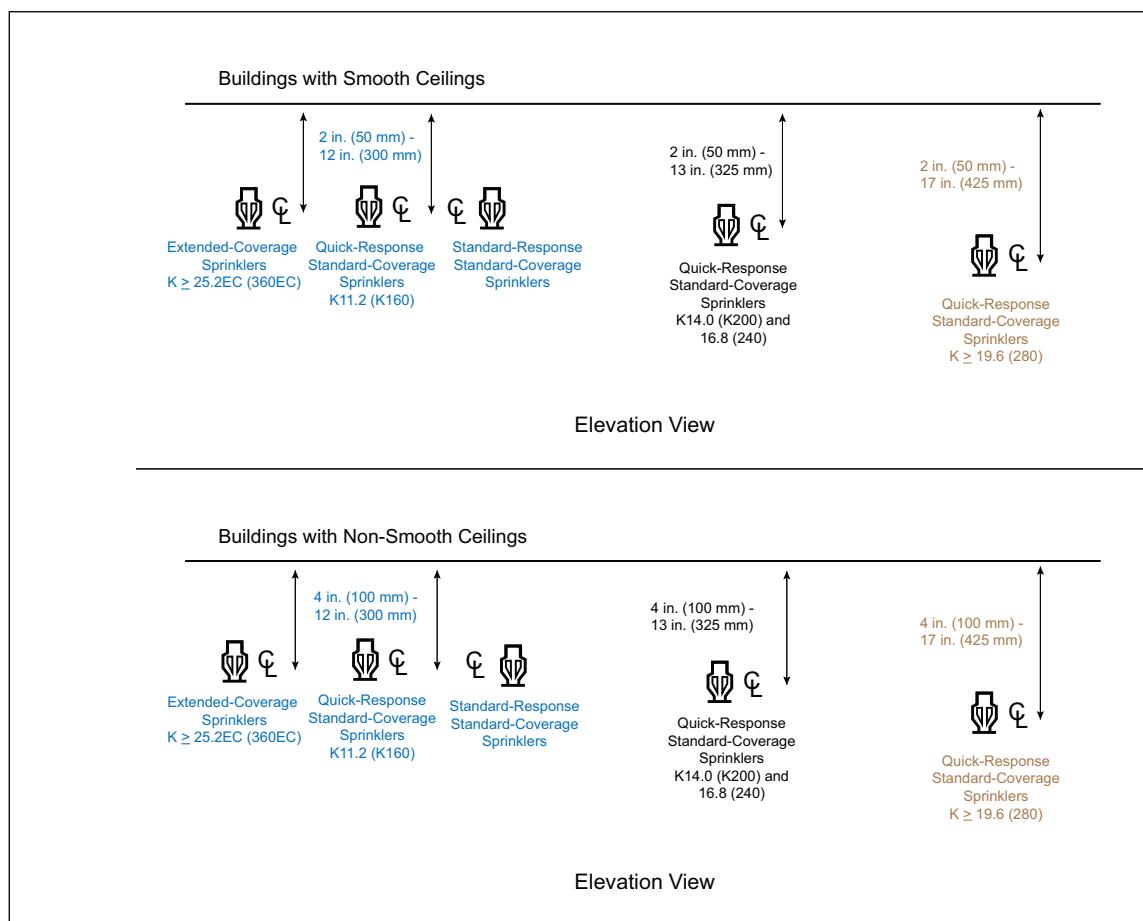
Vertical location of Storage sprinklers under unobstructed ceiling construction for various ceiling heights
